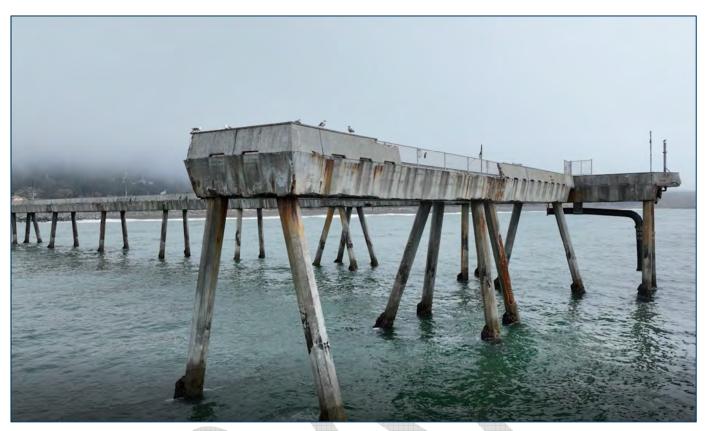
Deck Exterior around Bent 4 – West Face
